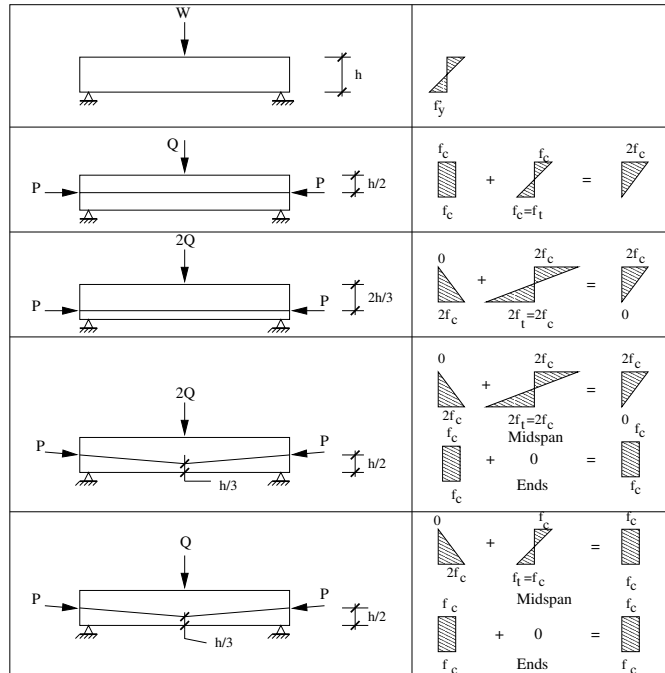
Alternative Schemes for Prestressing a Rectangular Concrete Beam, (Nilson 1978)
